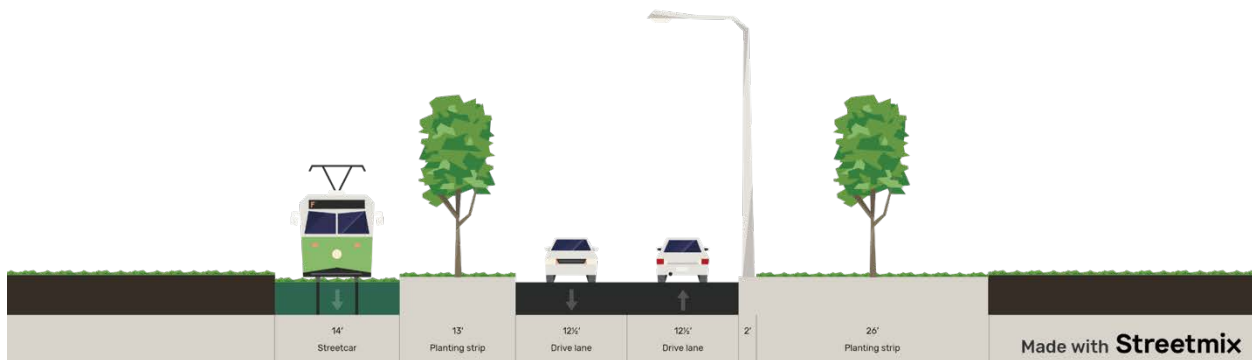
Street cross-sections for the northern portion of Collat Avenue. The northern portion has a freight rail spur just west of the street (represented by the streetcar). Street lighting is minimal, and the strip on the west side of the street is generally overgrown and appears to experience issues with litter dumping. Diagram created in Streetmix by EC, 2022.
